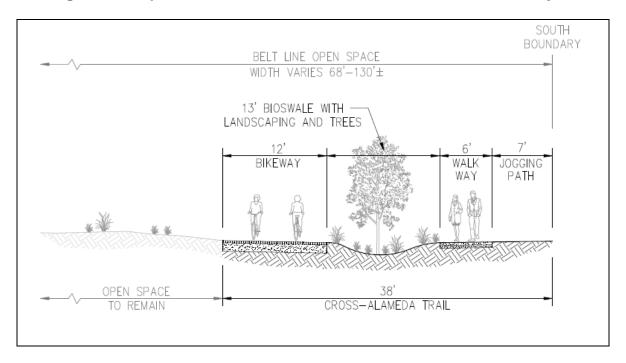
Proposed Cross Section of the Cross Alameda Trail Project
